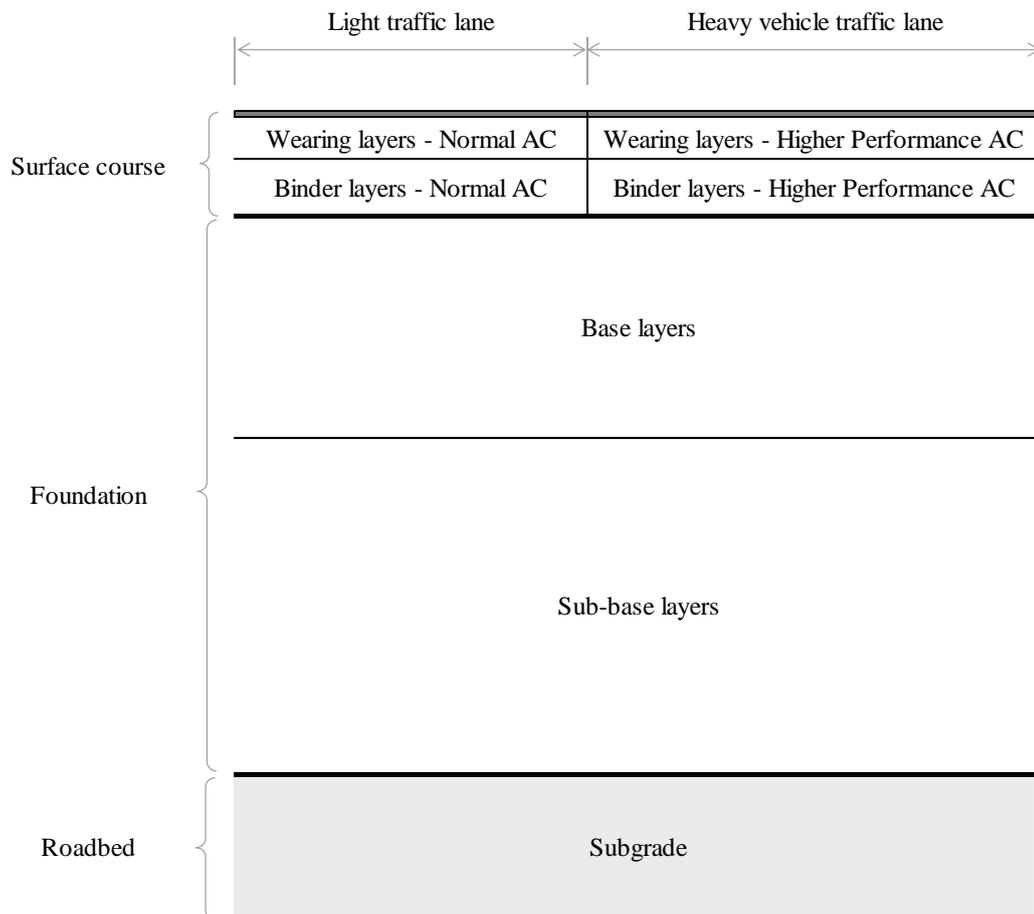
Pavement structures for light traffic lane and adjacent heavy vehicle traffic lane
